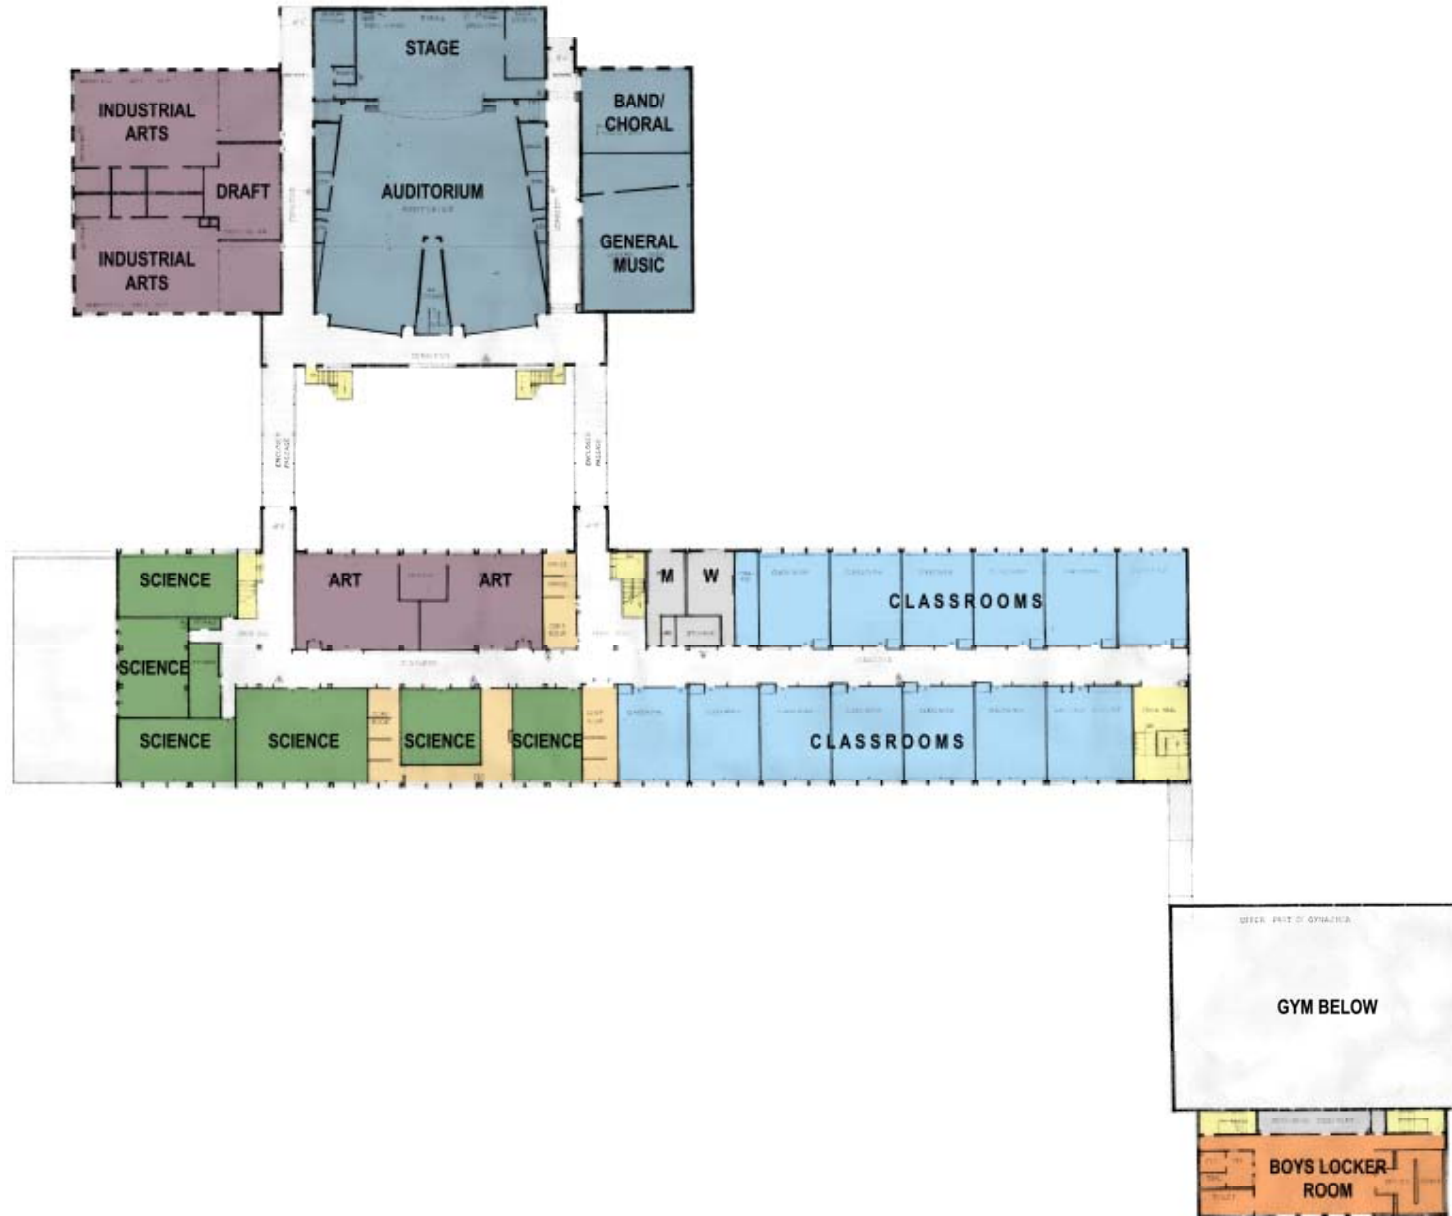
BRADDOCK MIDDLE SCHOOL SECOND FLOOR PLAN
